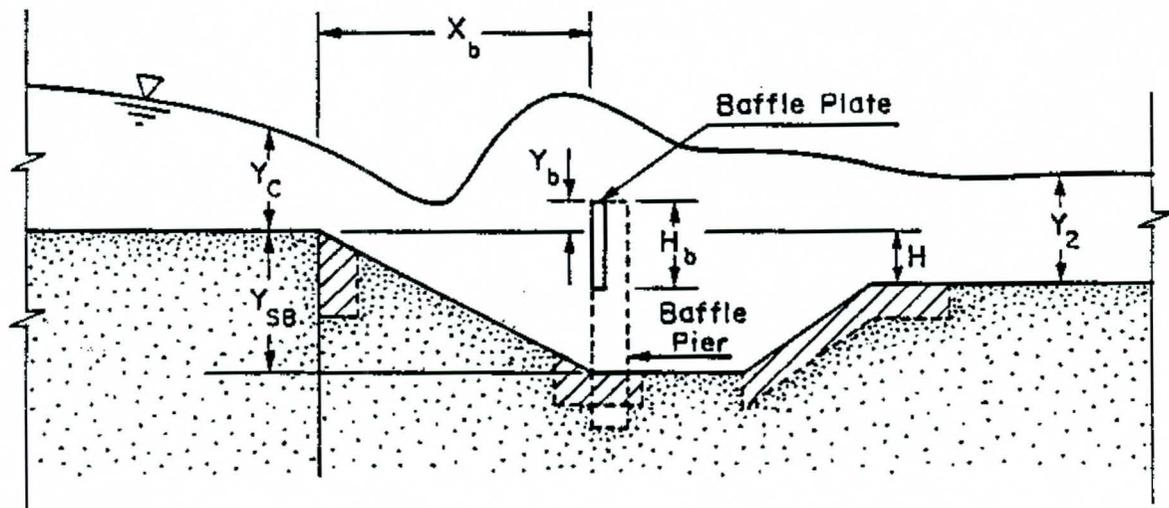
General design layout of stone-bed vertical drop structure stilling basin (after Smith 1985).
